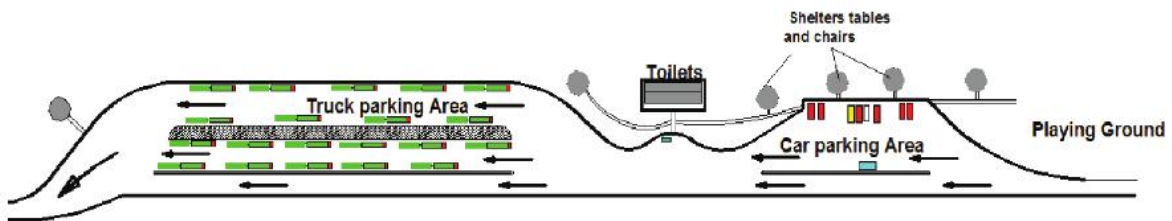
Typical layout design with truck and car parking of major rest areas –front to rear parking design (Source: Tanzania Draft Design Manual, 2010)
